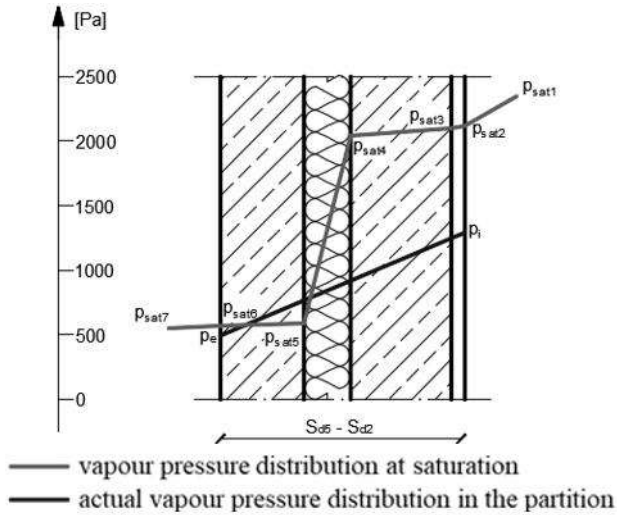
Distribution of water vapour pressure in the vertical section of the curtain wall in November in the building at 6 J. Śniadeckiego Street before thermomodernisation
